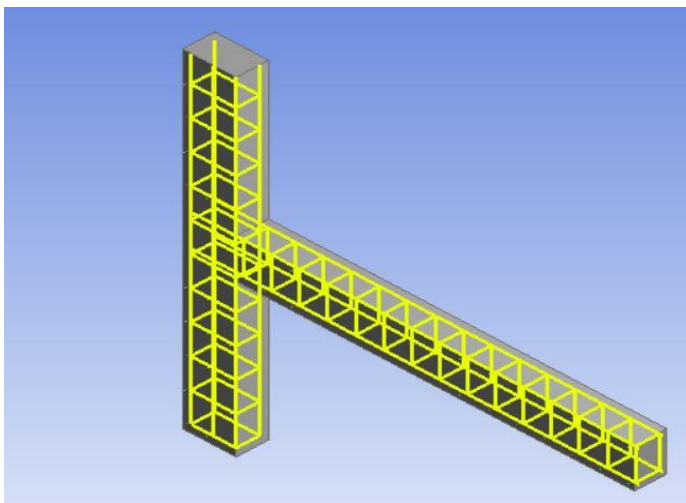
Beam-Column joint with reinforcement modelled in ANSYS
